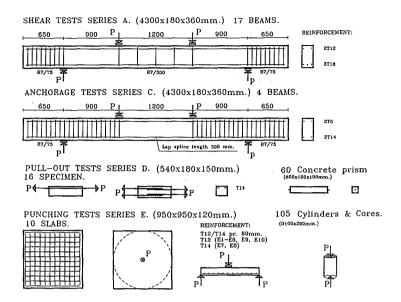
Test specimen, geometry, reinforcement, load and the principle of execution of tests are shown. All dimensions are in mm.
